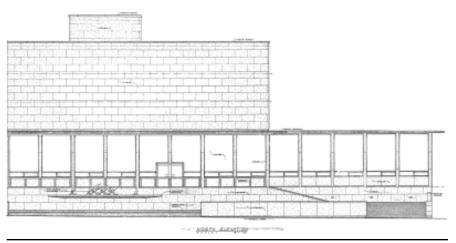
1957 Detail of the North Elevation prepared by Paul Thiry. Drawing courtesy of the Washington State Department of General Administration Archives.
